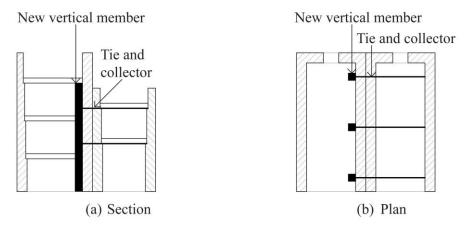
Two idealized and retrofitted URM buildings showing the vertical structure required to transfer forces from the diaphragms of one building to those of the other where the diaphragms are at different levels. The primary retrofit structure and upgraded diaphragms are not shown.
